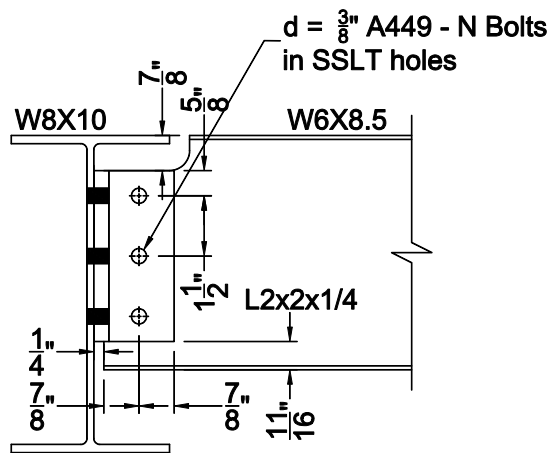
Half-scale Beam-to-Girder Single-Angle Connection
